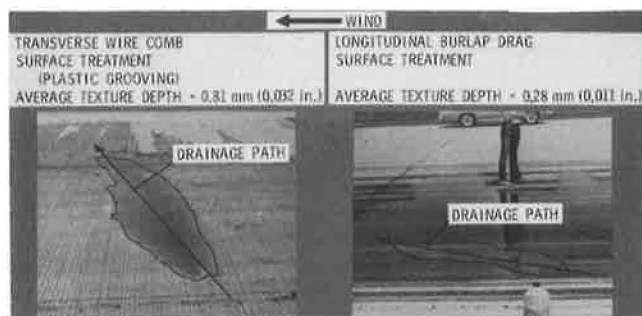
Water drainage from concrete runway at PHF. Water truck wetting; runway 6/24; wind from 60° at 10 knots.
